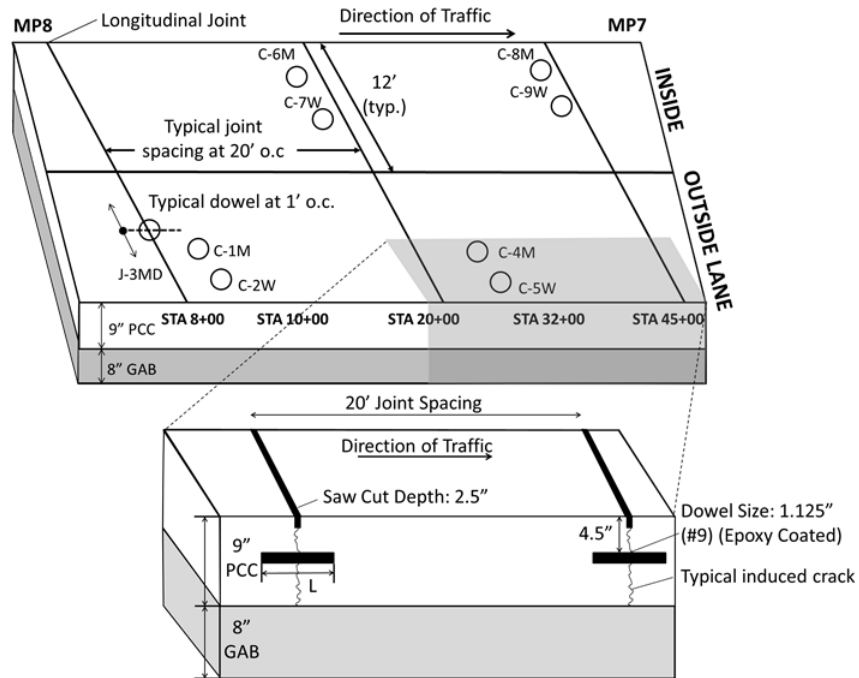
3D View of Coring Locations and JPCP details for SR 22 (good condition).
